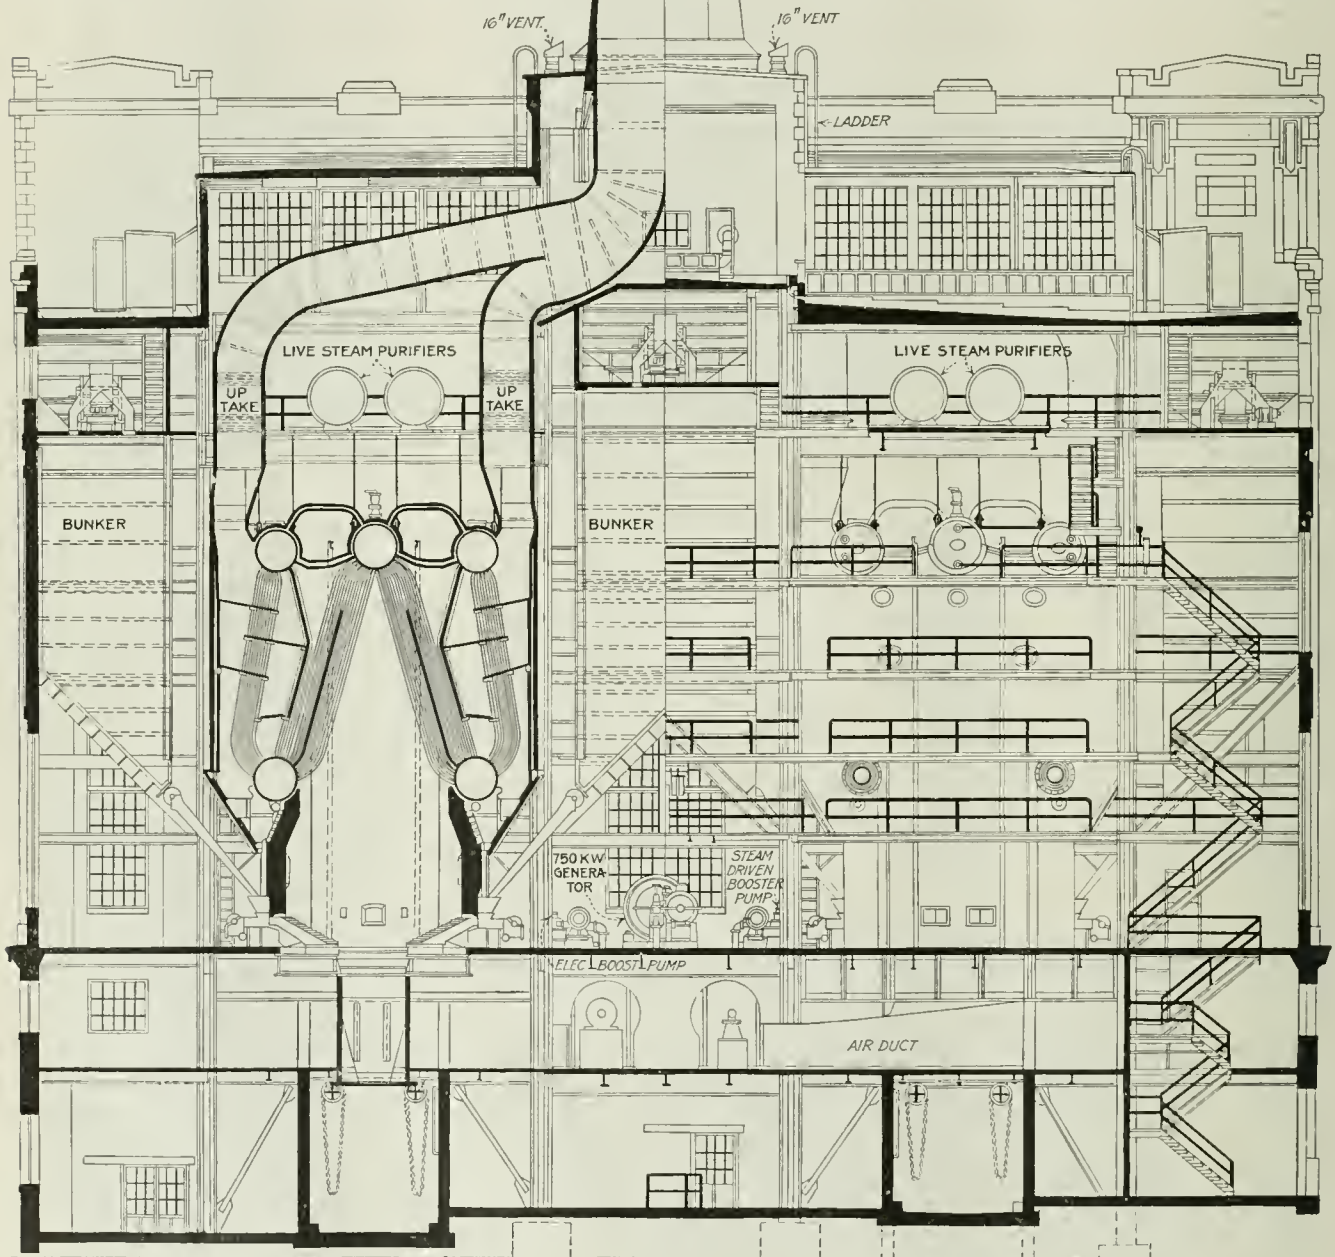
SECTIONAL ELEVATION OF THE CONGRESS STREET HEATING PLANT
